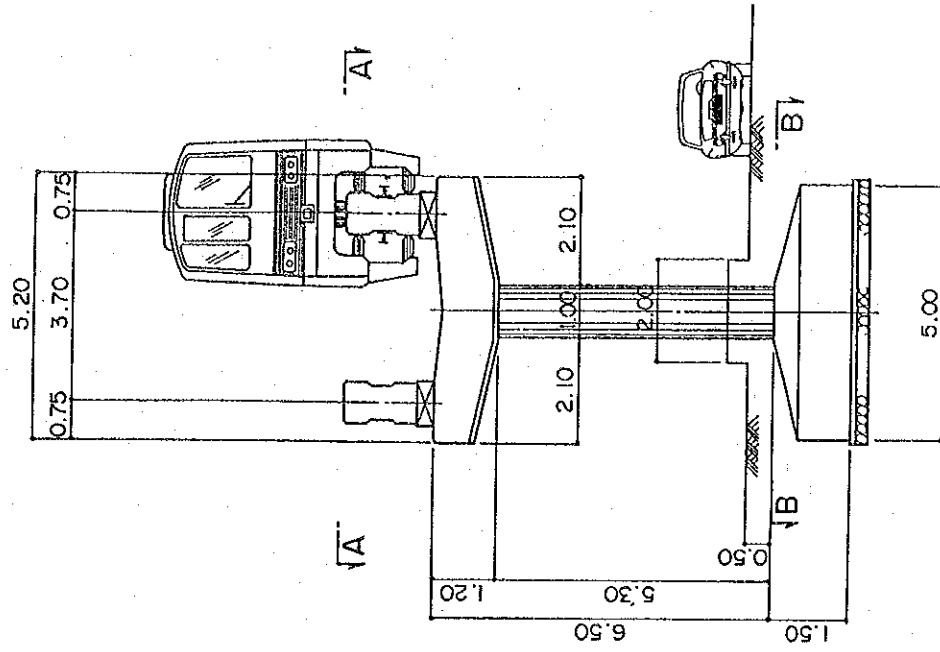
Standard Elevated Section (Rubber Tire Railway)
